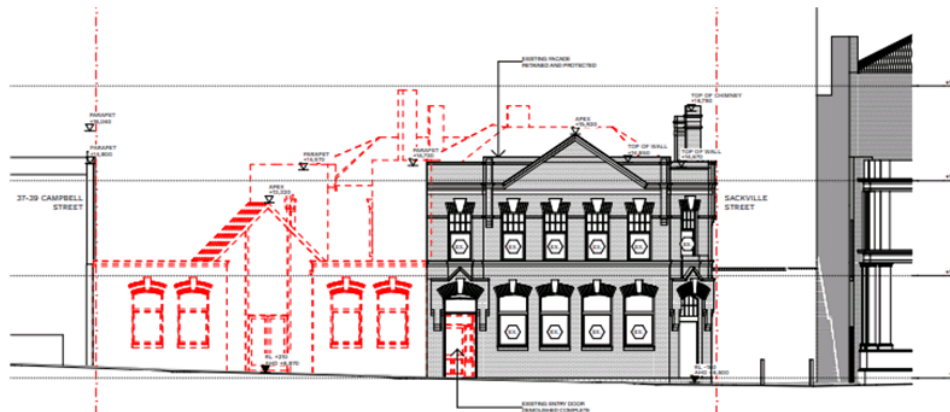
Proposed Demolition Campbell Street Elevation (Source: Cumulus)
